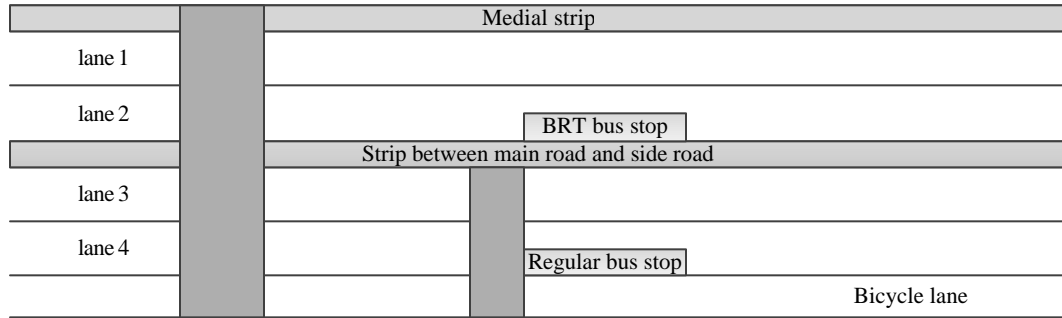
Typical illustration of a road section with pedestrian crosswalk and bus stop
